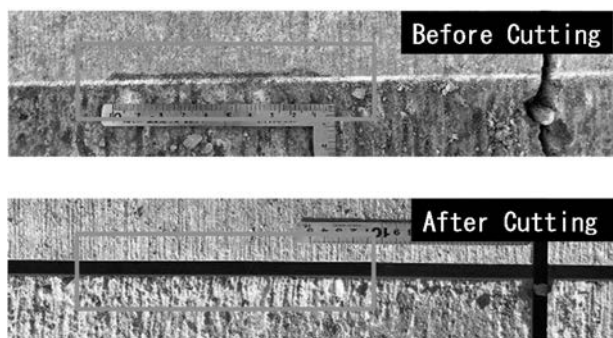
Removal of Tag Marks by Joint Cutting (Passing-#8)
